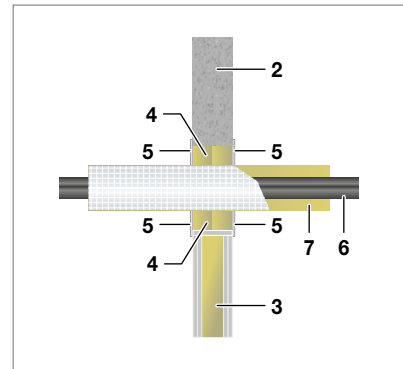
Soft firestop in the solid wall and light-weight partition with Viega piping system plastic
